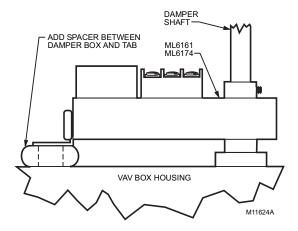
Mounting actuator to VAV box when actuator is not flush with box.
